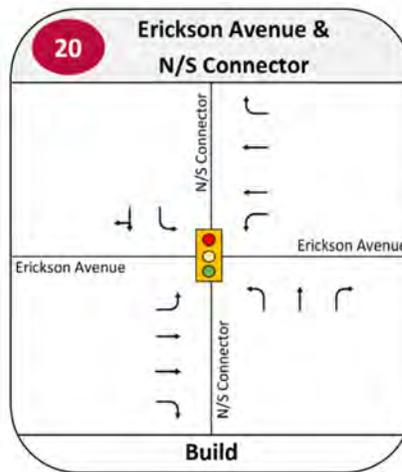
Build Lane Configurations at Erickson Avenue and North-South Connector
